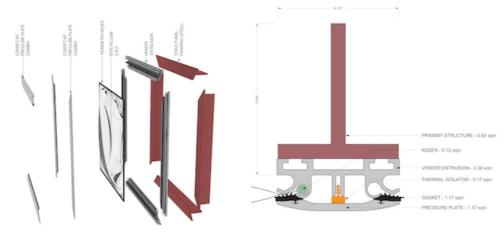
Exploded ETFE assembly for 1x1 meter, Figure 4a – ETFE assembly detail
